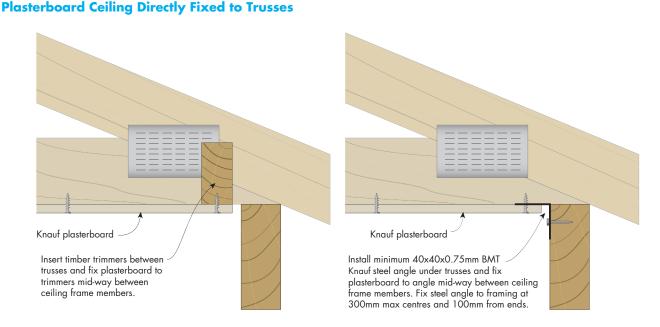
Plasterboard Ceiling Fixed to Roof Truss With perimeter timber trimmers between trusses
